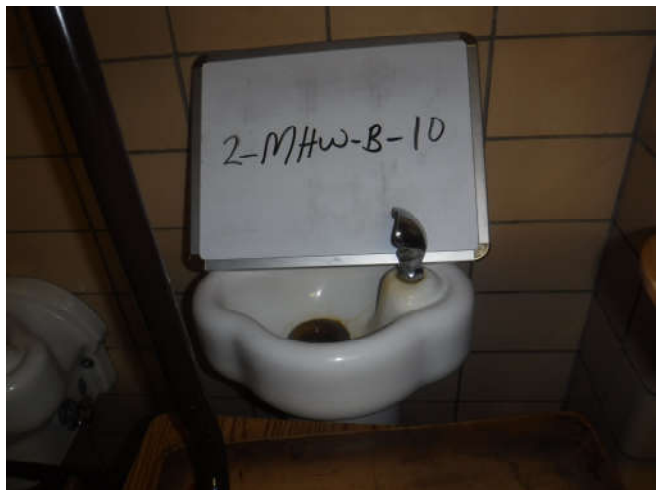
Bubbler, located in a 2nd floor, Across from room 208, bet. Rooms 207 & 209 (right) (Middle School)
